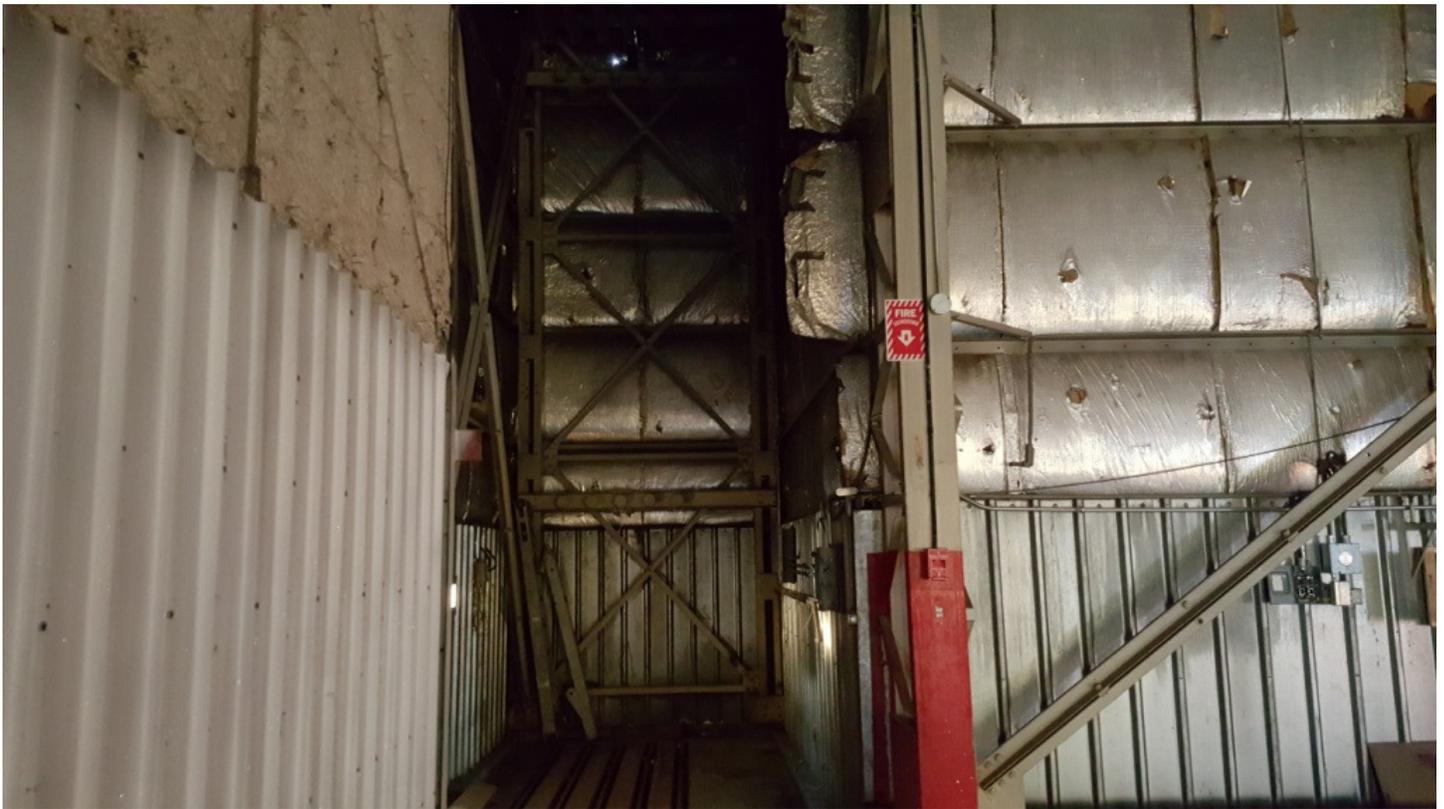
Interior Elevation Showing Column Spacing and Height at Hangar Door Storage Area.
